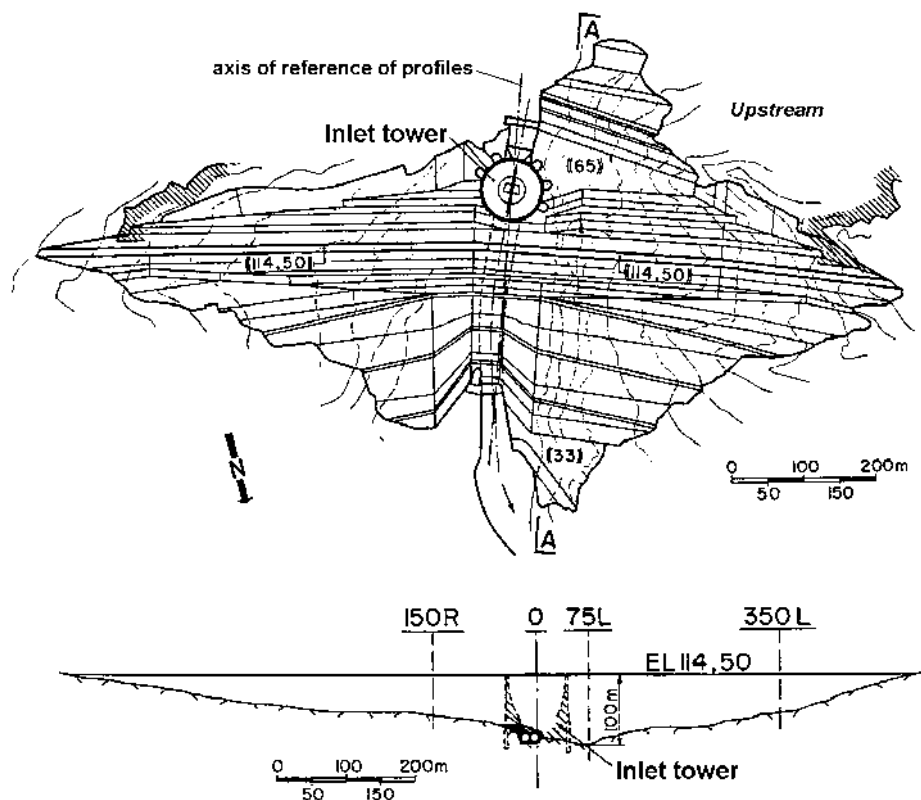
Djabatiluhur dam, plan and longitudinal section (Farhi and Hamon 1967)
